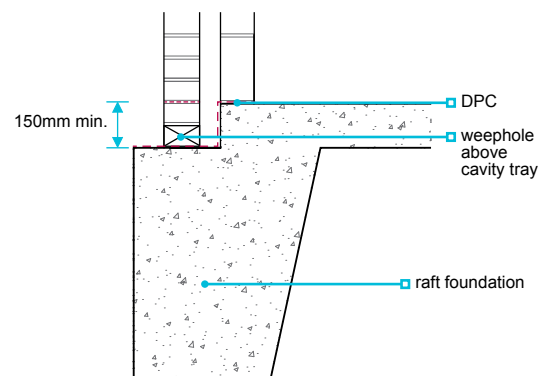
Typical DPC detail to an external wall at ground level when built off a raft foundation
